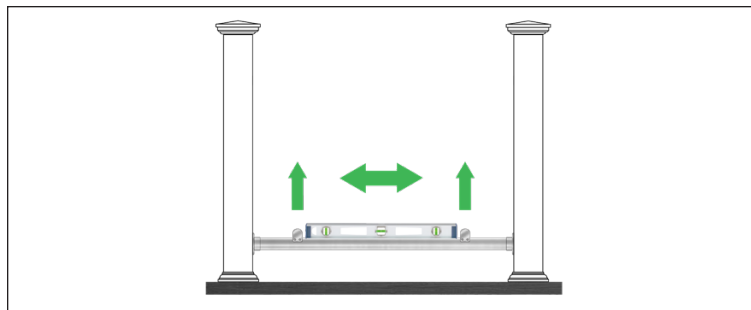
sidemount installed, level rail and mark, pre-drill and install the other sidemount. Make sure Glass Panel Connectors are centered and plumb (vertical).
